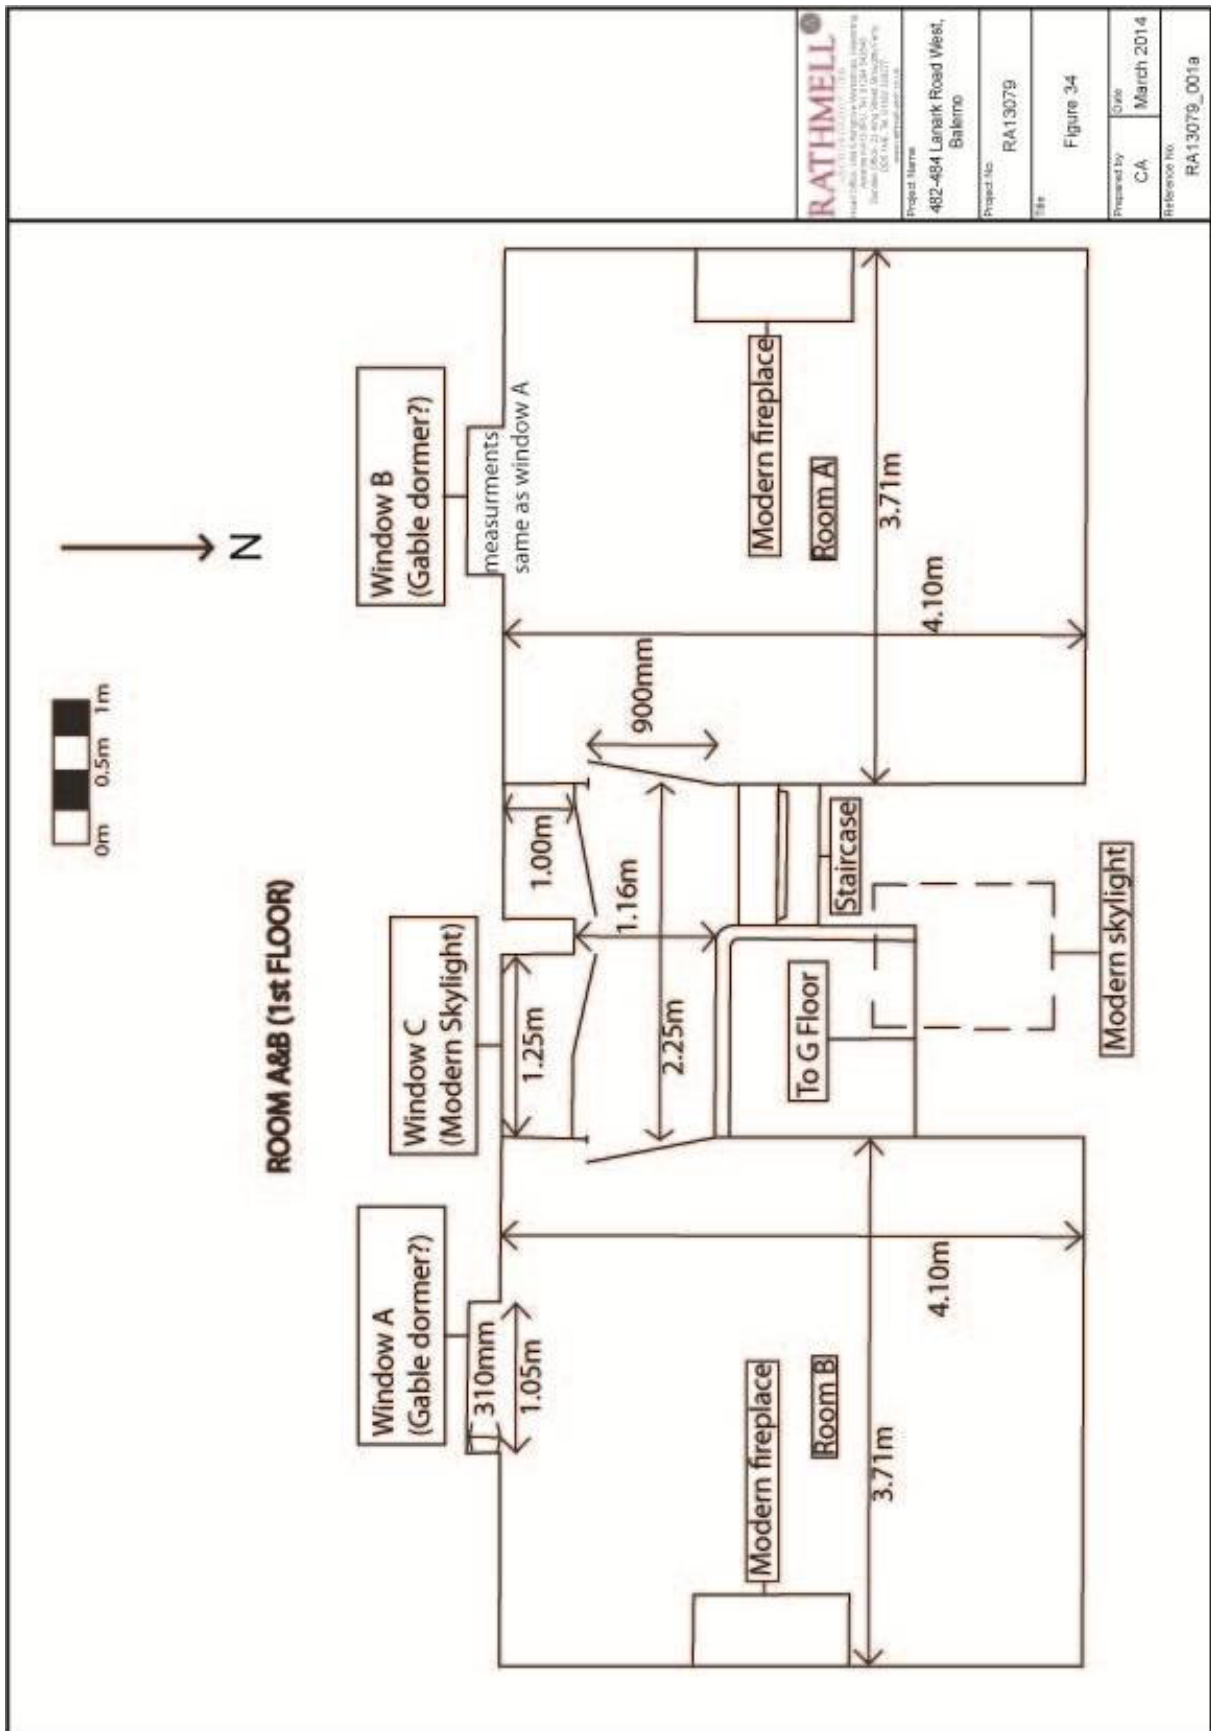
Building A - Plan of Rooms A and B and stairway/landing on 1st floor.
